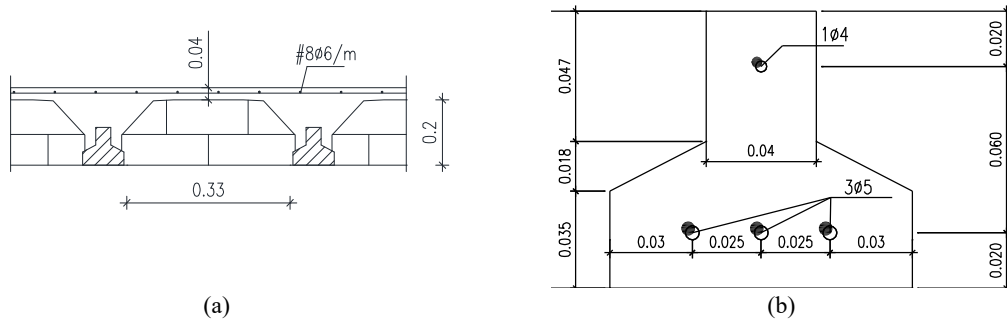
Building flooring system (dimensions in m): (a) schematic drawing; (b) precast and pre-stressed concrete joist.
